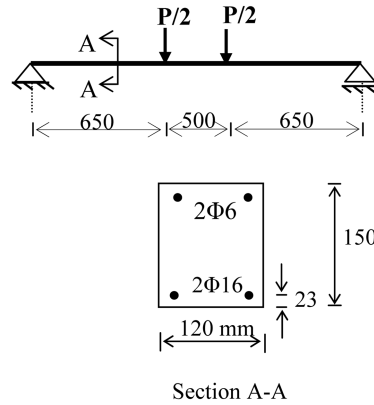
Simply supported steel fiber reinforced concrete beam with two point loads tested by Chunxiang and Patnaikuni (1999)
